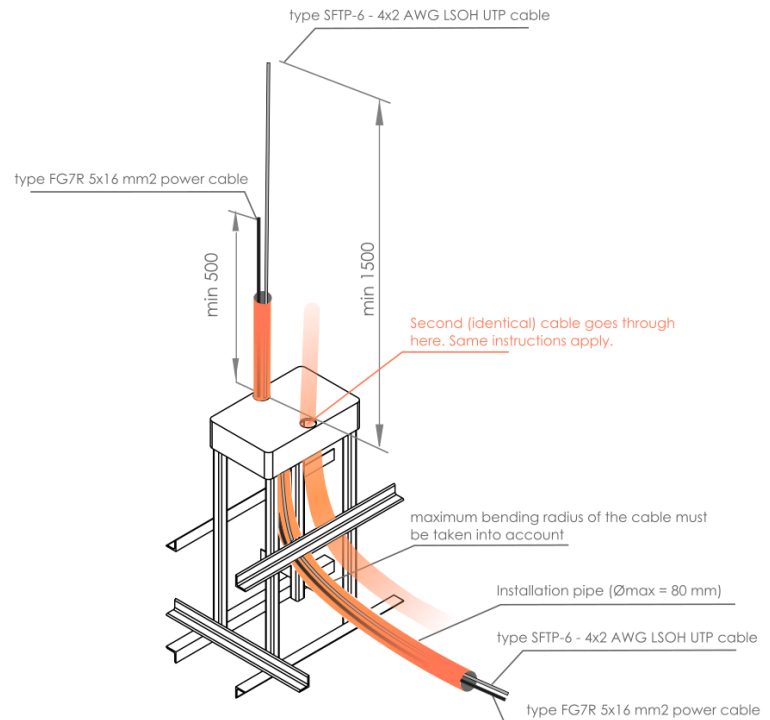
Placing of installation pipe and insertion of cables. Supply cables are routed through the underground anchoring structure with the use of the installation pipe as shown in the figure above. The exact way of routing the cables depends on the type of the cables used and their diameter (which is determined in the Electrical installation documentation). When dealing with cables with larger diameters, their bending radius must be taken into account. Appropriate length of cables must reach through the upper opening for later connection of the charging station.
